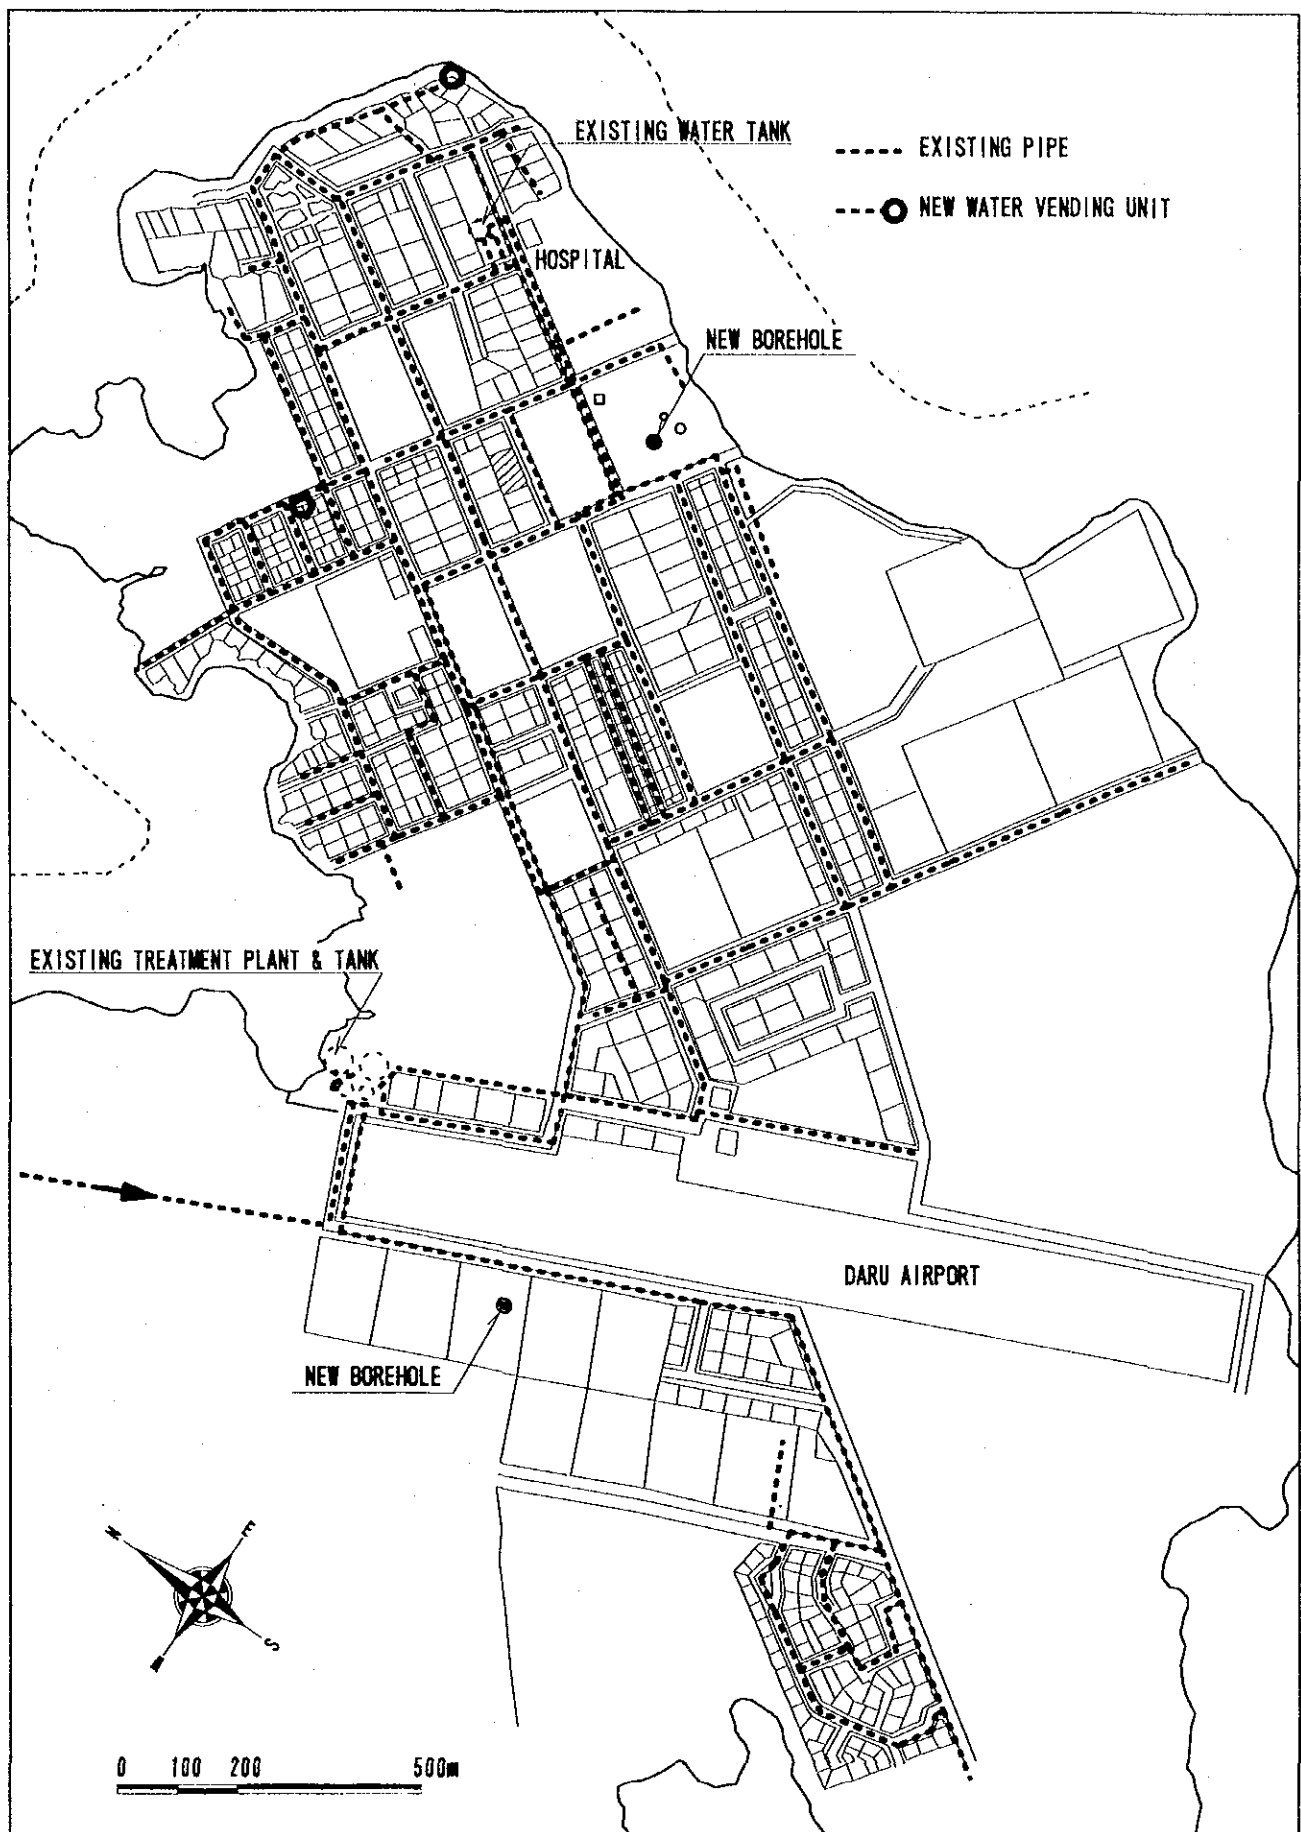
SITE PLAN FOR VENDING FACILITIES (DARU)
